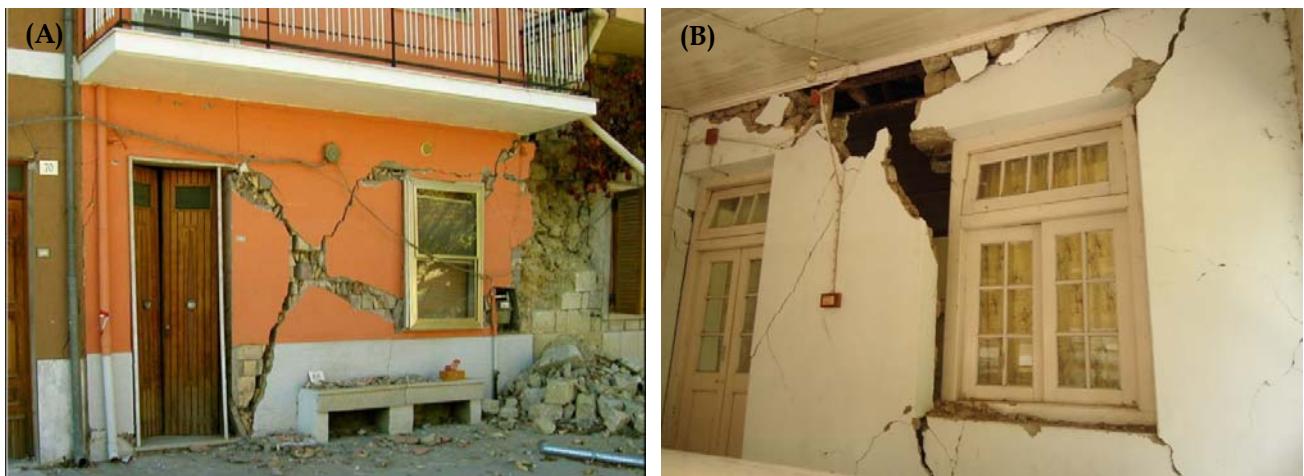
(A) Life safety hazard to building due to collapsed adjoining structure; (B) Life safety hazard to buildings downslope due potential sliding or collapse of heavily damaged uphill building
